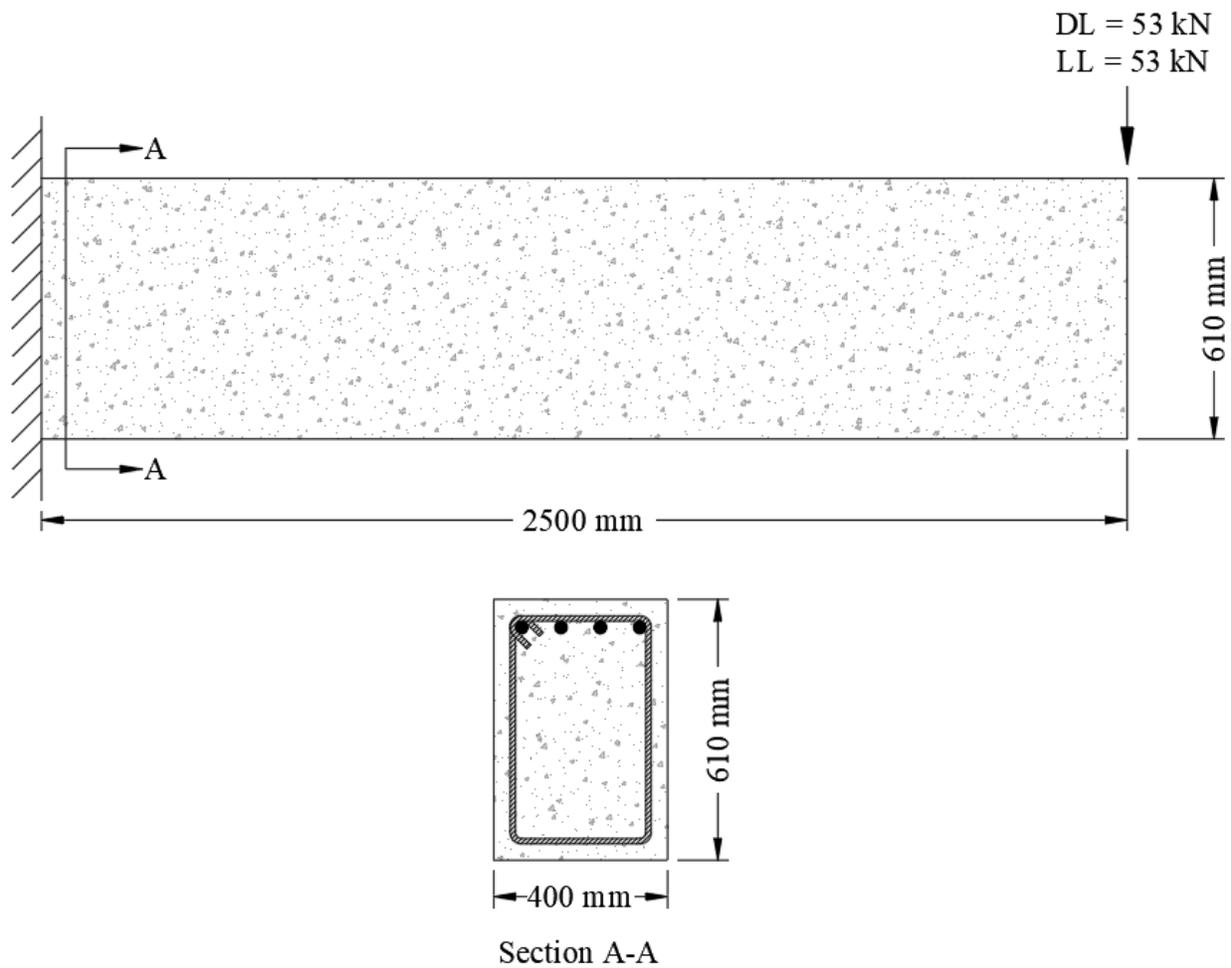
Rectangular Reinforced Concrete Cantilever Beam
